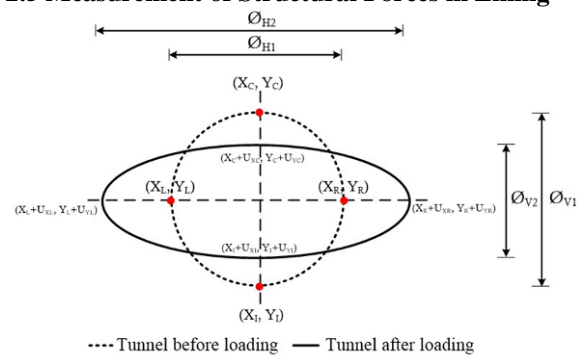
Positions to observe the structural forces in tunnel lining and tunnel deformations
